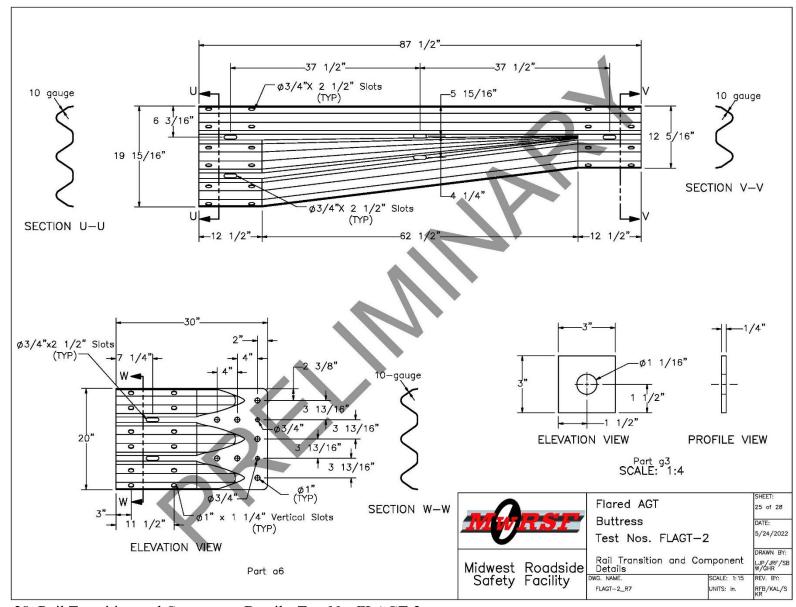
Rail Transition and Component Details, Test No. FLAGT-2
